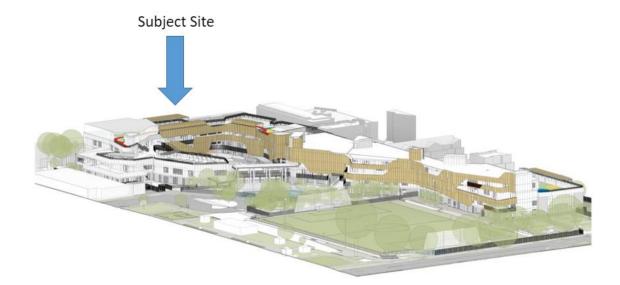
Illustration of redeveloped school, showing site's relative location over southern boundary
